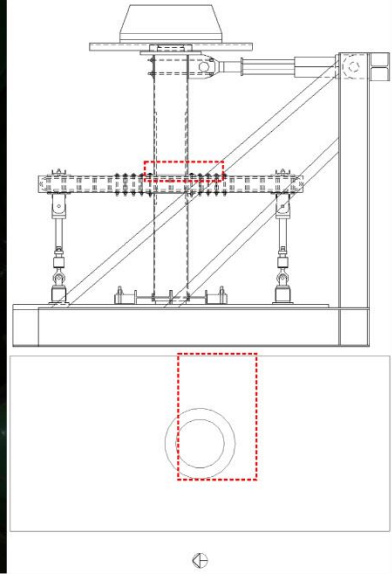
Bottom South Side Bar Buckling – 6.2% Drift (PTB\_4.5\_1\_4)
